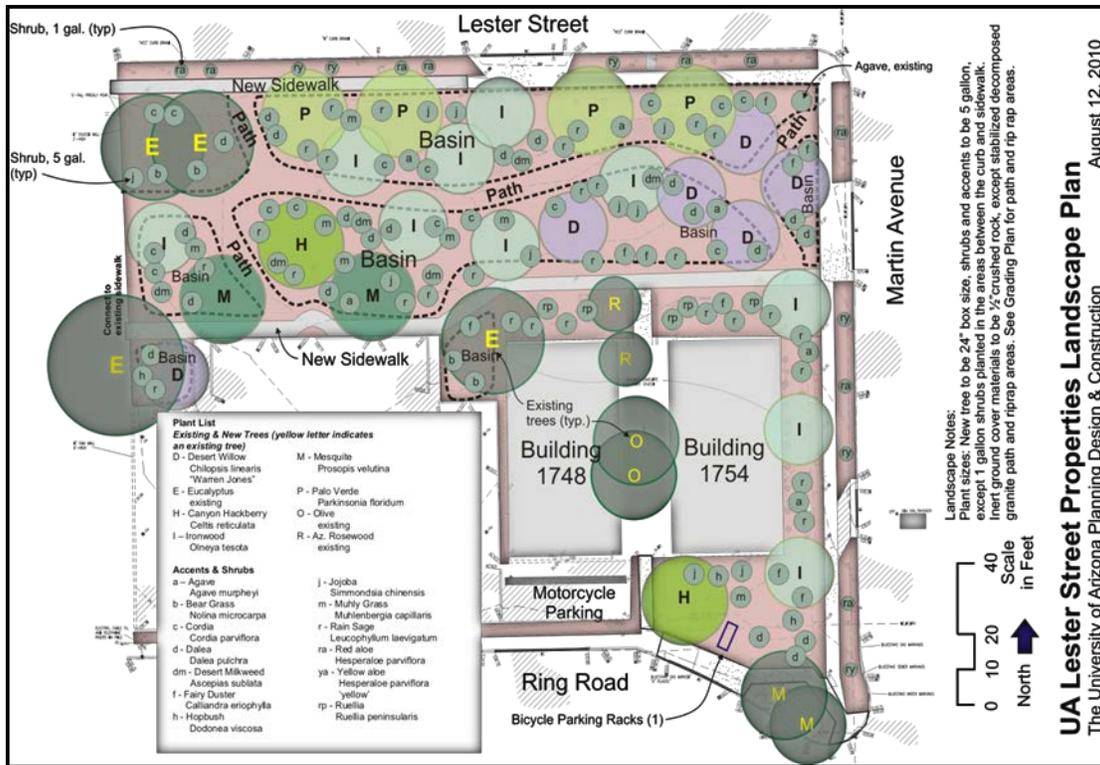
An Example LID Landscape Concept Plan (University of Arizona, Department of Planning, Design & Construction).
